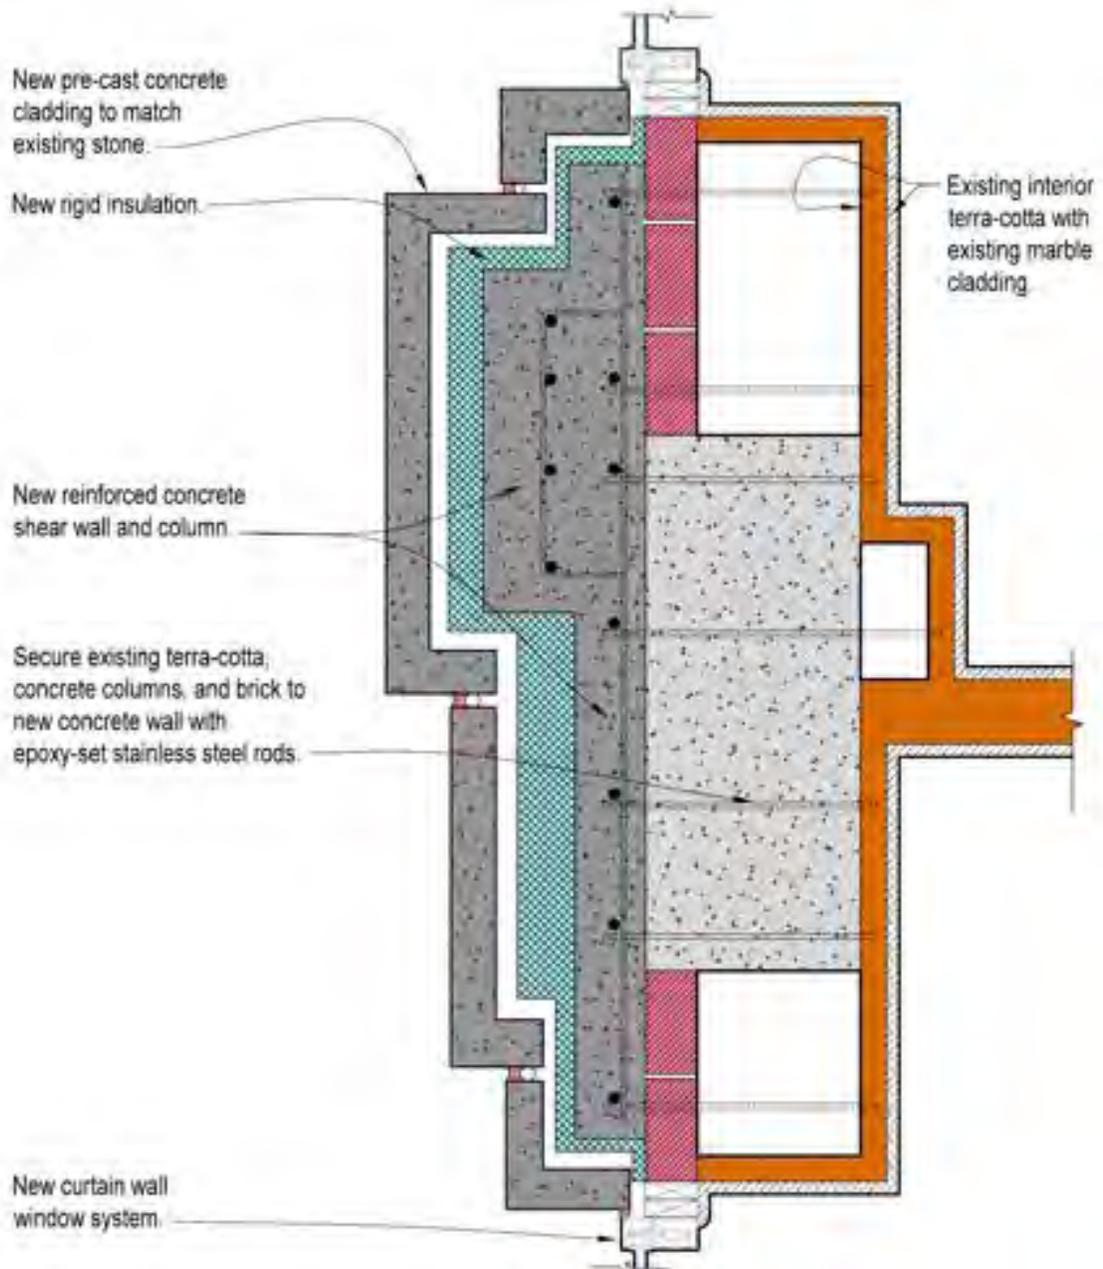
(1): Typical Portico Stone-Clad Wall Corrections
